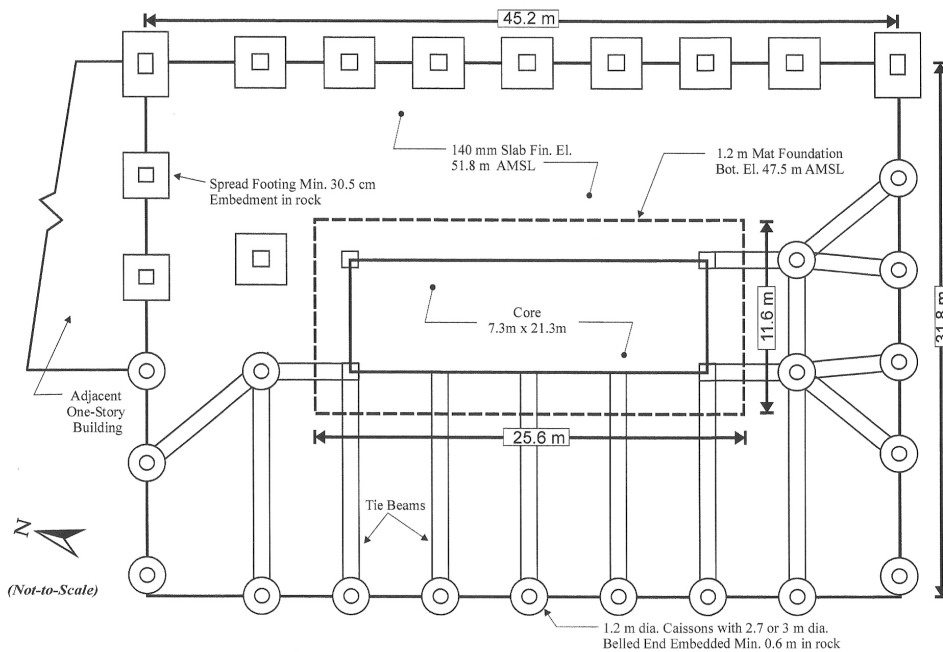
Walnut Creek building foundation plan, based on construction drawings provided by CSMIP.
